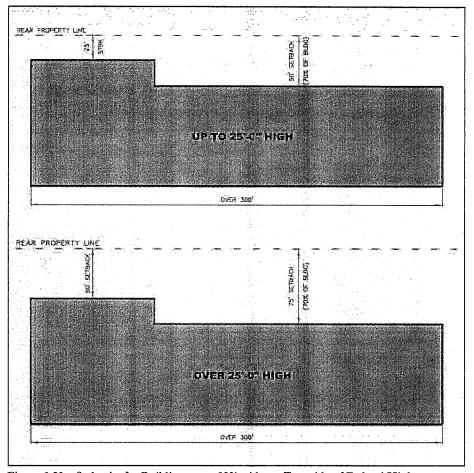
Setbacks for Buildings over 300' wide on East side of Federal Highway
